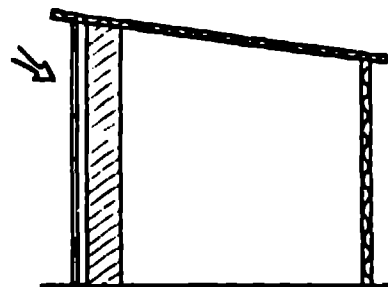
Thermal Storage wall. Sunlight penetrates glazing and is absorbed and converted to heat at a wall surface interposed between the glazing and the heated space. The wall is usually masonry (Trombe wall) or containers filled with water (water wall), although it might contain phase-change material.
